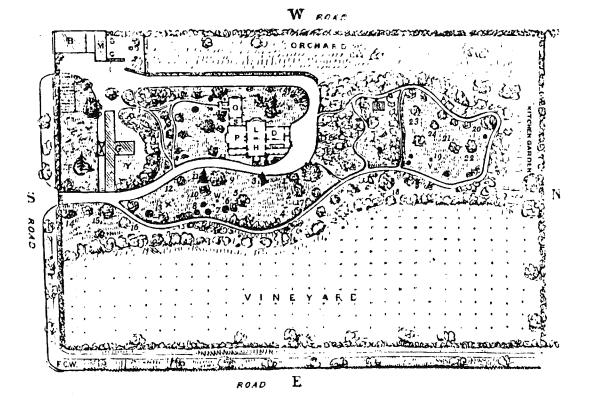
Site Plan, Andrew Jackson Downing's House, Newburgh, New York
